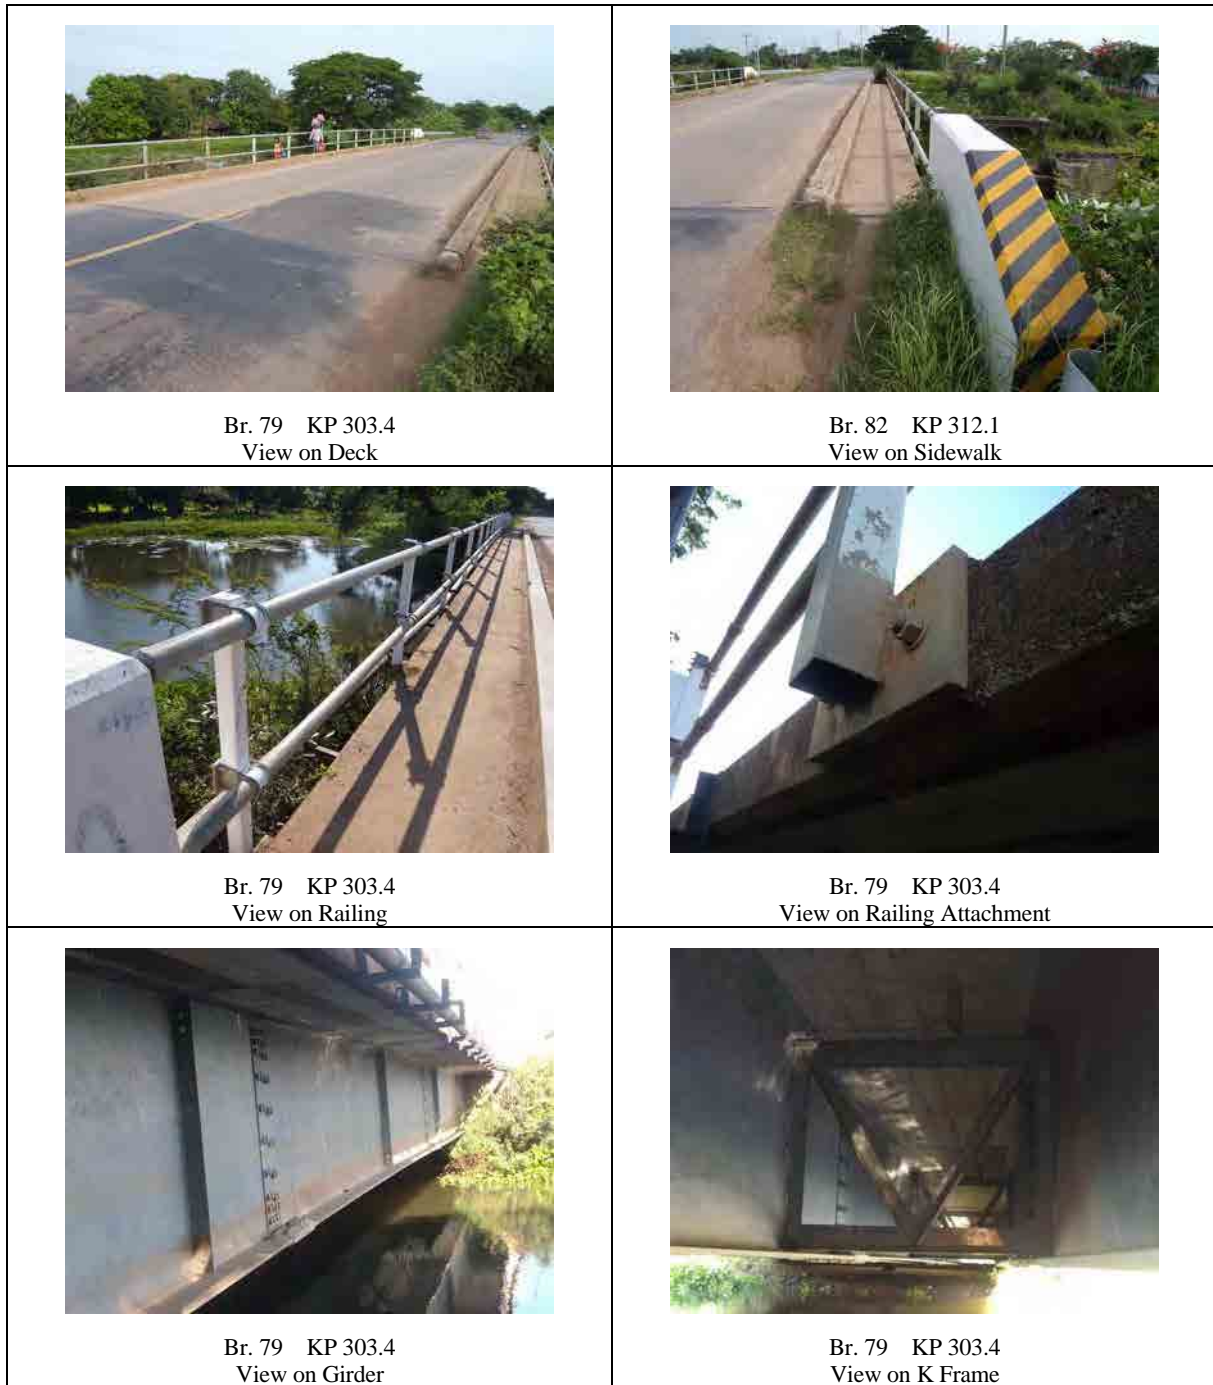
Existing Bridges Br. 79 and Br. 82
